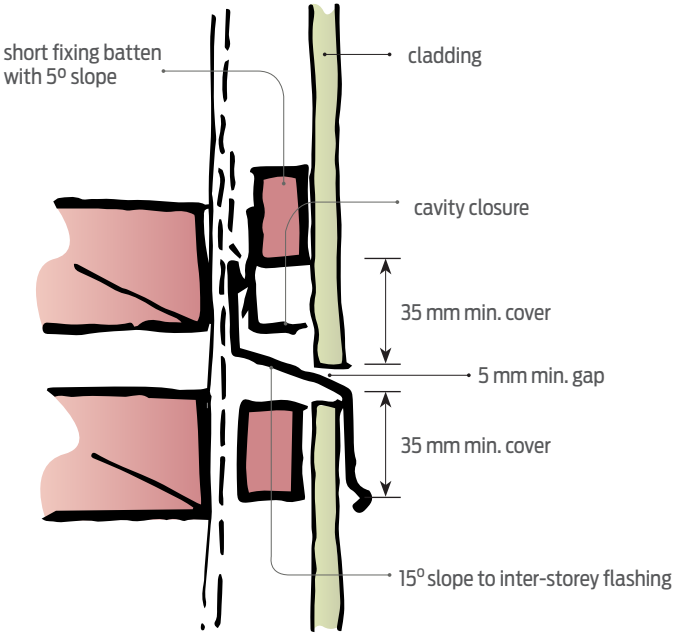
Minimum 15° cross-fall for inter-storey flashings.
